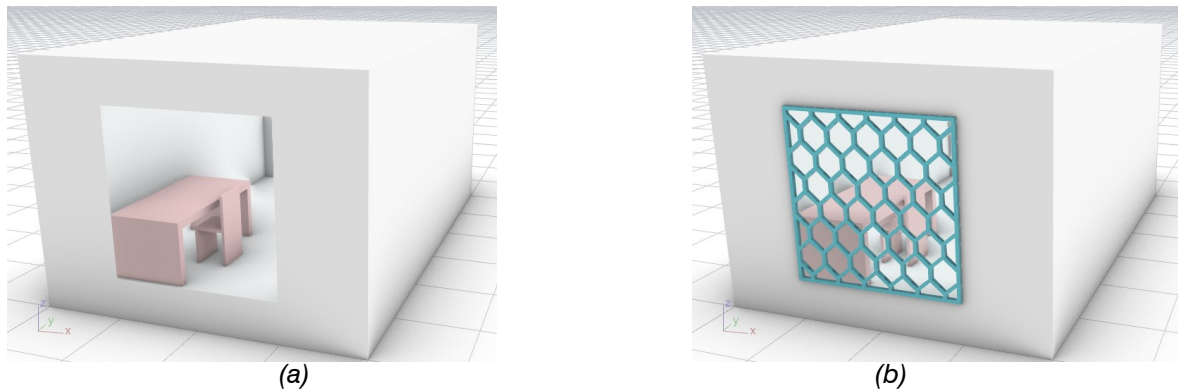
(a) Standard room used for testing; (b) example model with façade sandwich panel
